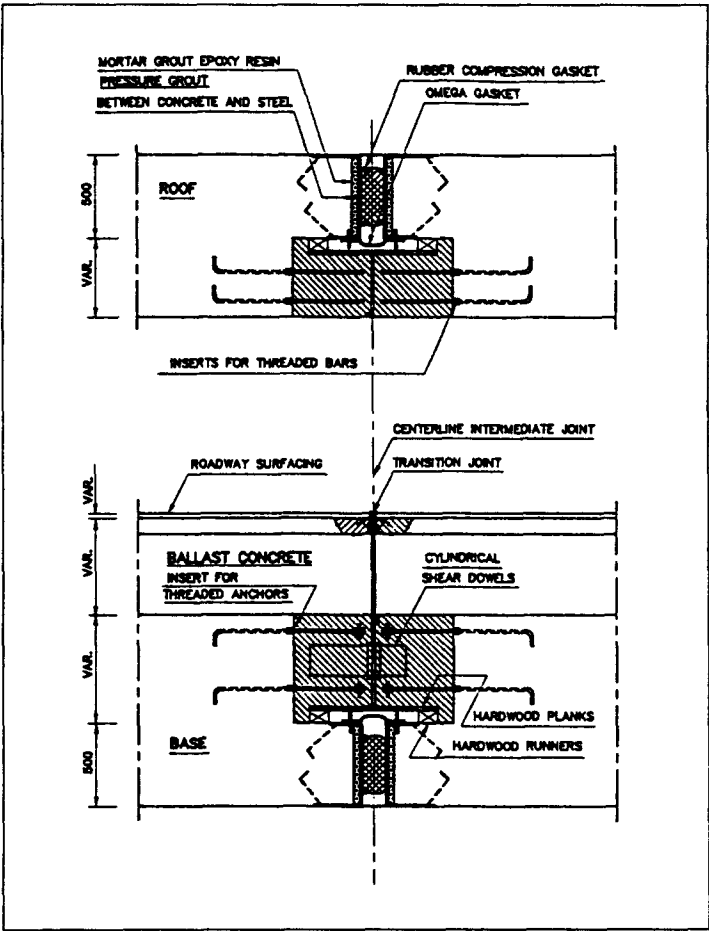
Intermediate flexible joint for concrete tunnels (Dutch solution).
